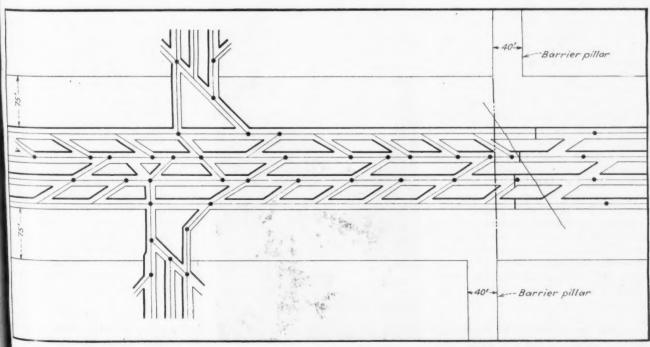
Plan of main entry layout, showing how working panel is turned off; maximum entry width, 14 ft.
